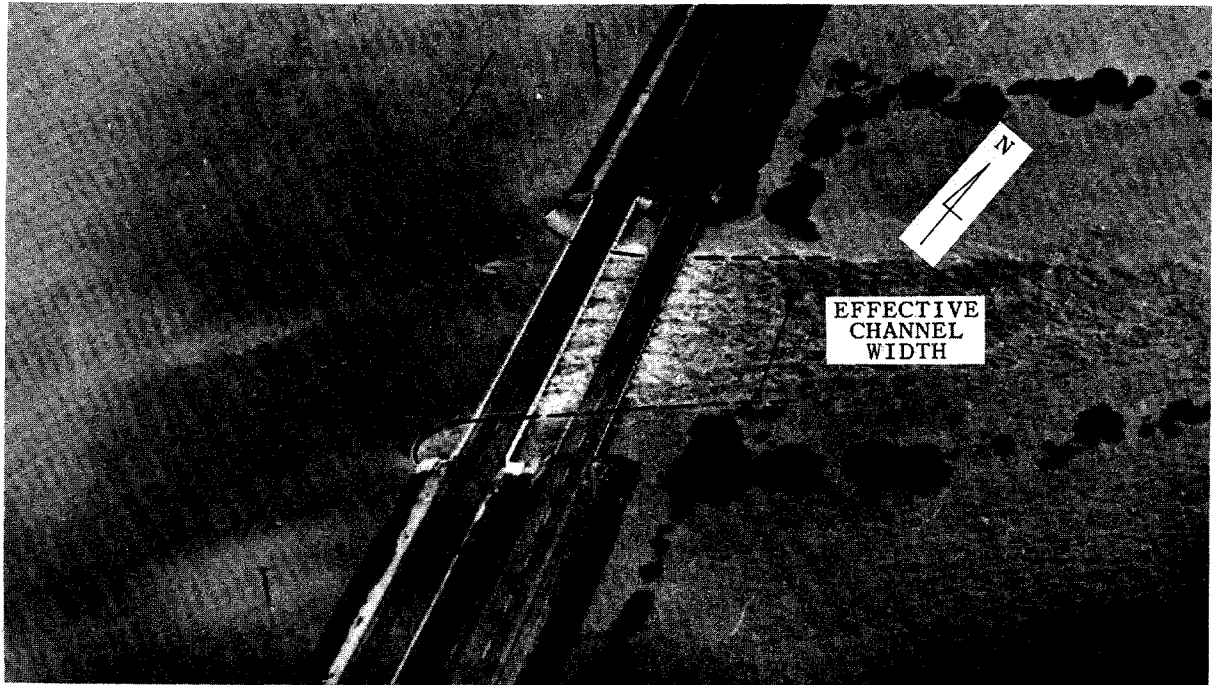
Aerial photograph, on which flow constriction at overflow bridge "C" is indicated, taken before collapse of spans of downstream bridge. (From Texas Dept. of Highways.)
